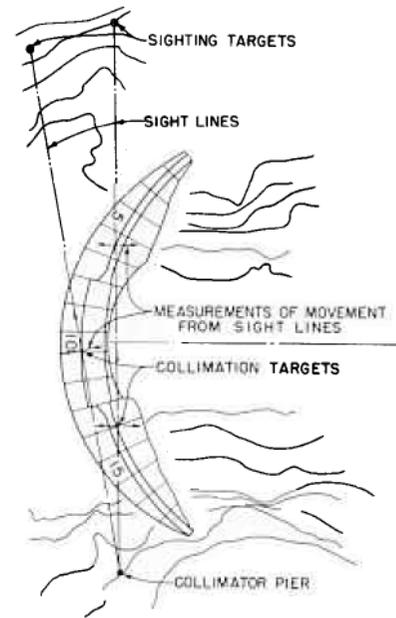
A collimation system layout for an arch dam.—288-D-3097
